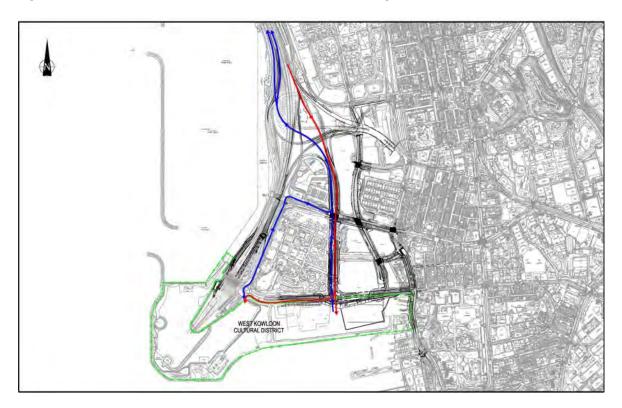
Construction Access Points and Traffic Routing for Batch 1 Construction Upon Commissioning of LCR-AURW Underpass
